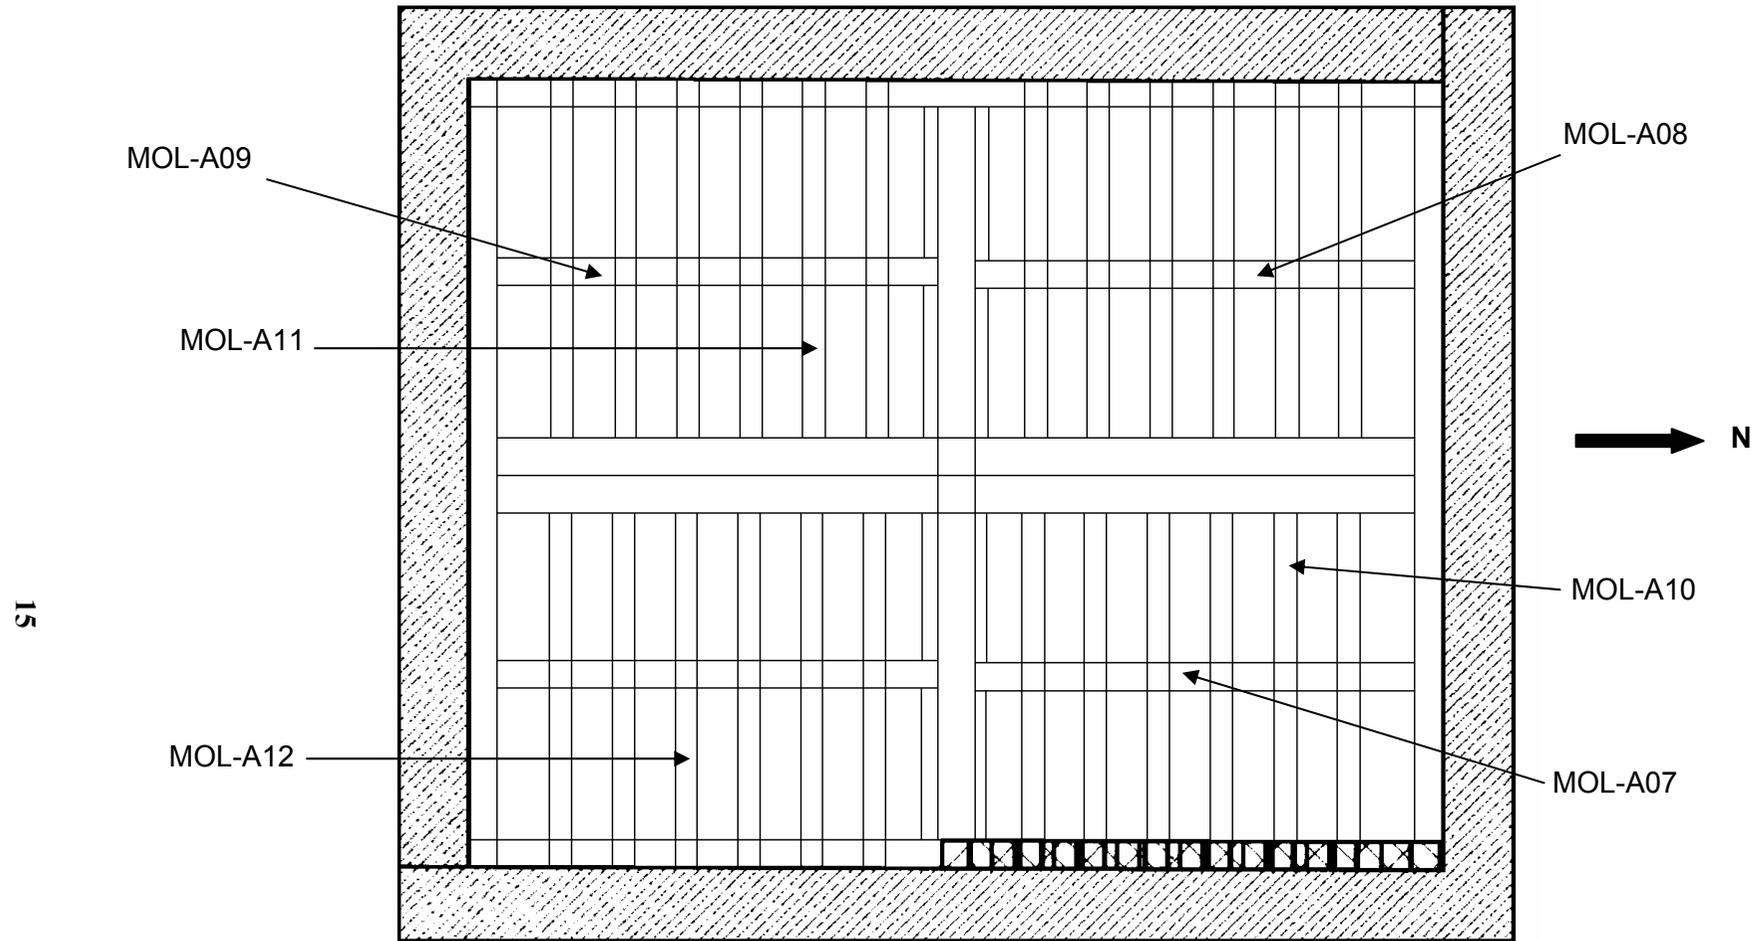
Plan of roof structure, showing the location of samples MOL-A07–12 (Hockley and Dawson)
